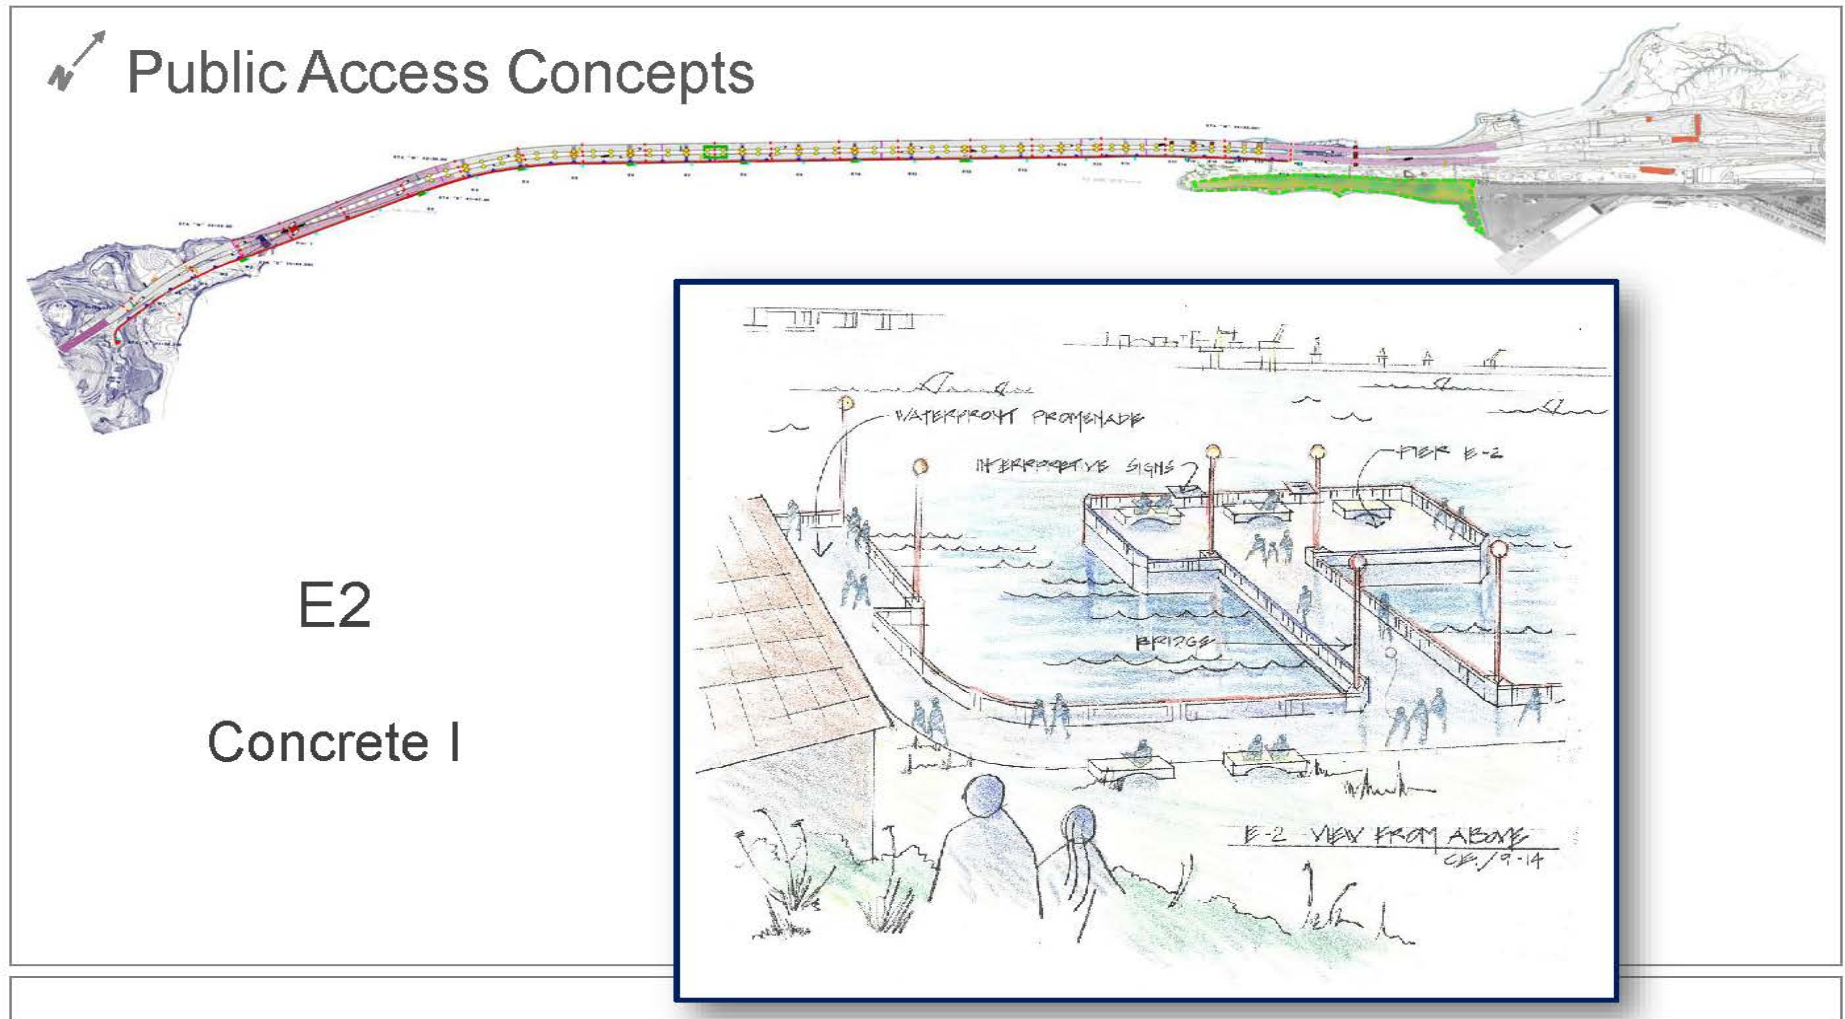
Conceptual Plan of Precast Box Girder Bridge at Pier E2 (YBI)
